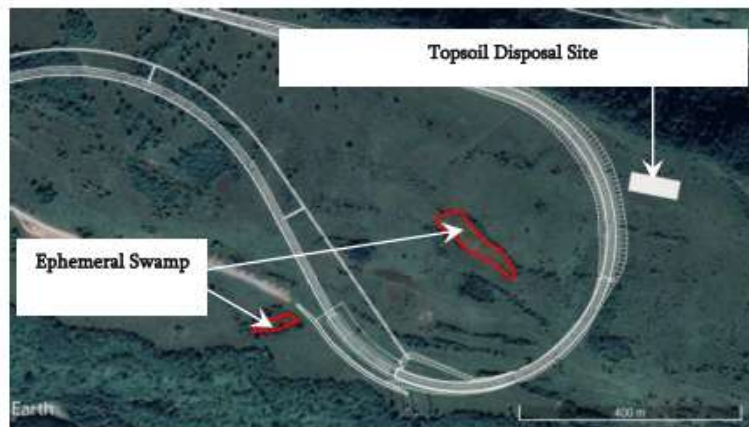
Topsoil Disposal Site (Didveli Plateau)
